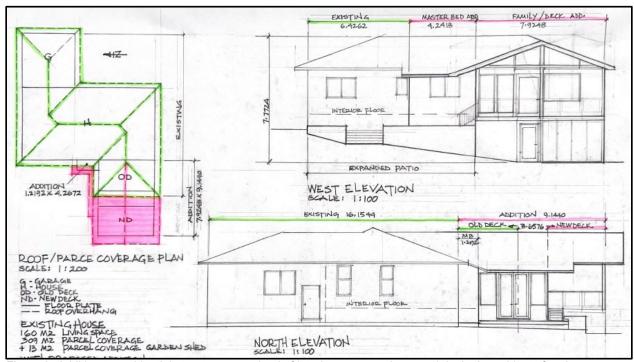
Addition to residential structure comprised of interior space and covered deck, the subject of variance proposal (roof of addition and covered deck structure in pink).
